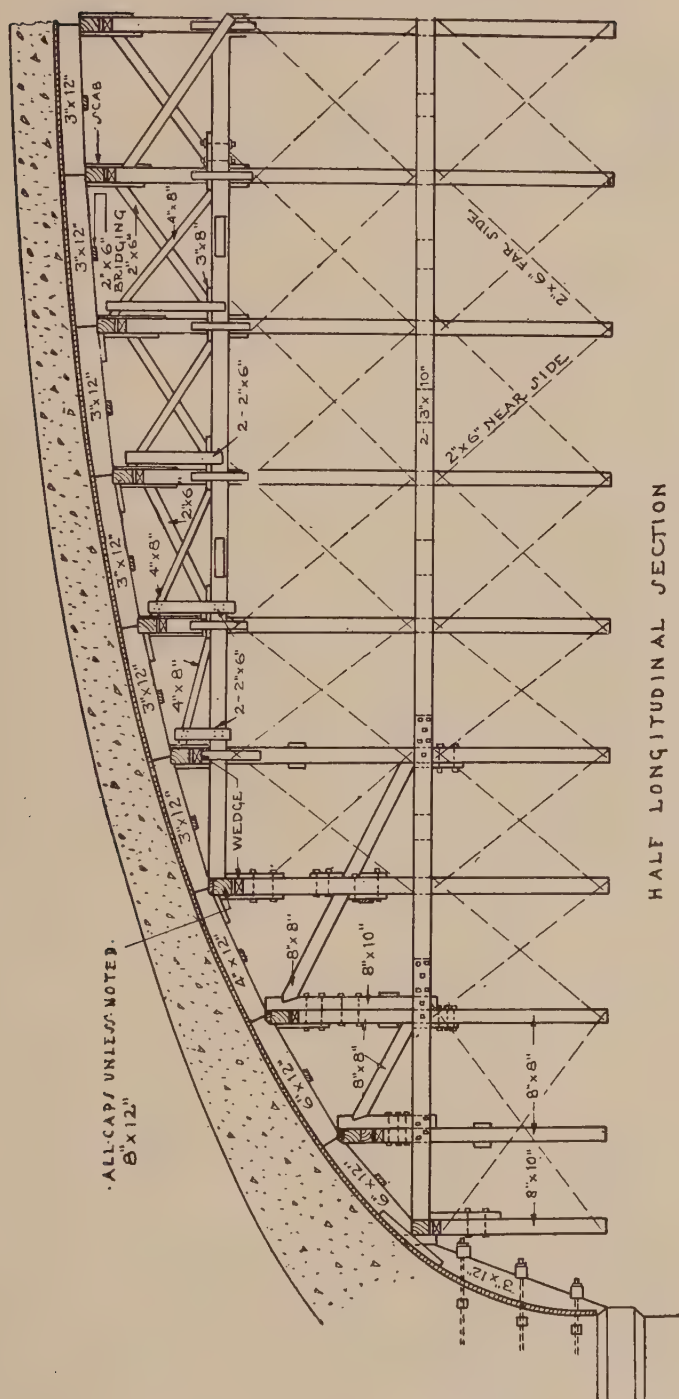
Arch centering for two-span bridge combining truss and fan-shaped bracing.
